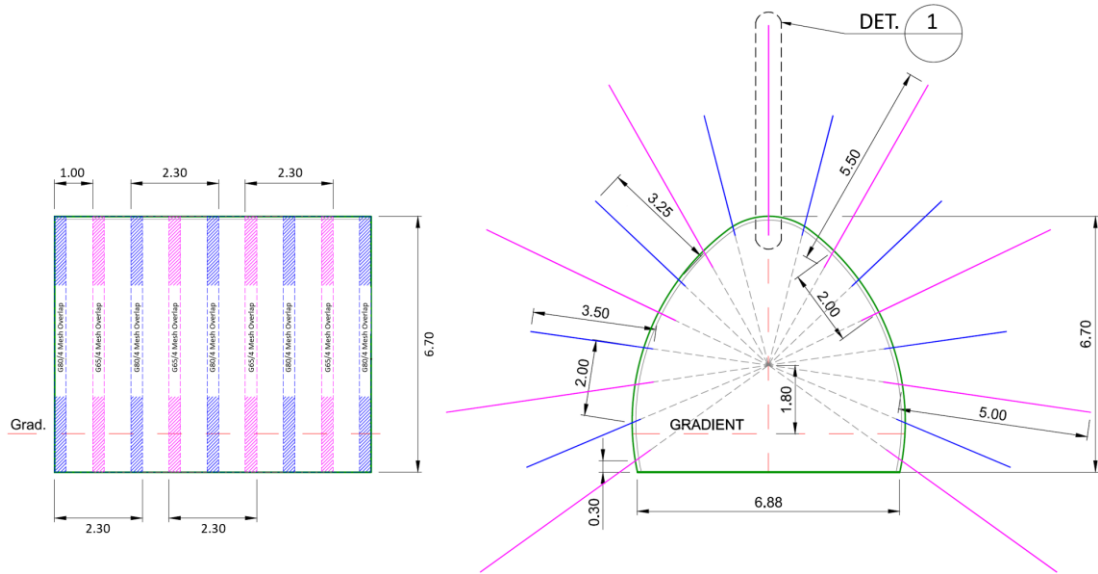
Mesh overlap pattern and complete ground support scheme arrangement at Cross-Section B.
